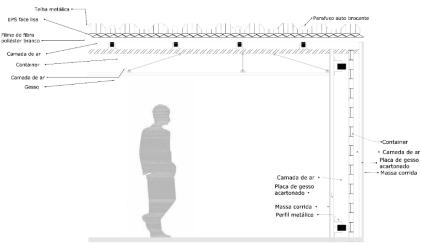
Schematic Drawing of the Roof and Wall Section.
